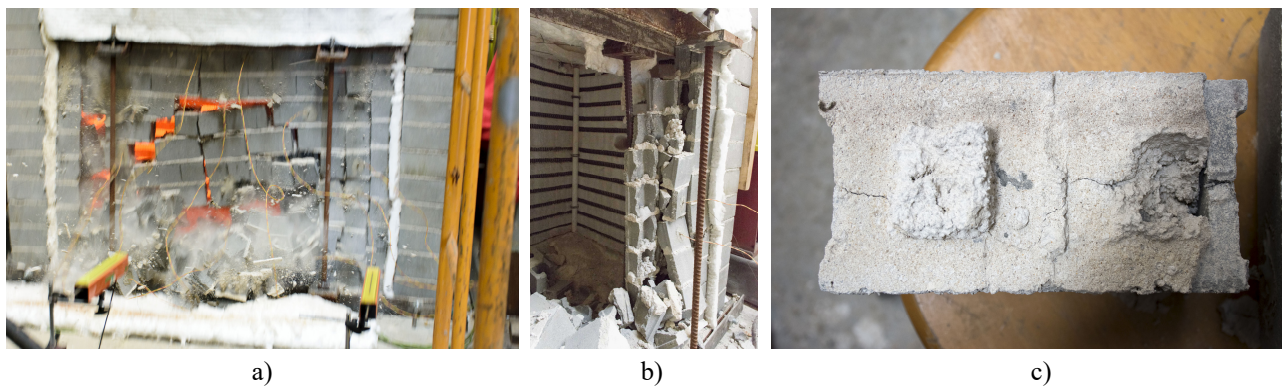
Specimen 4 – a) Sudden collapse of the wall in a test; b) vertical cracking of the blocks in both directions c) block with cracks
